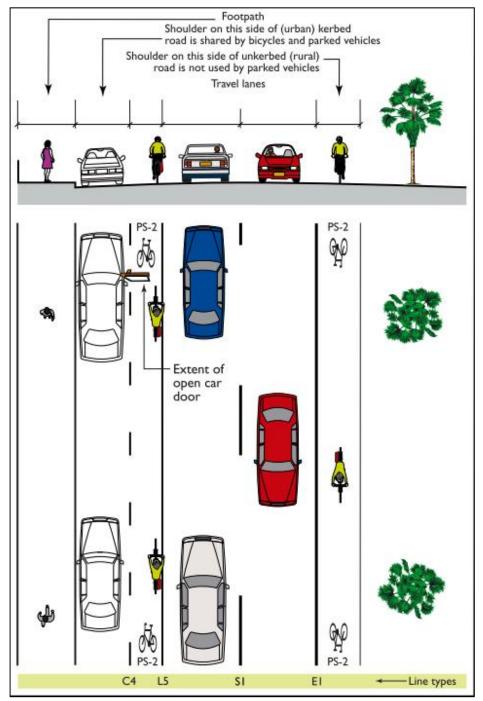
Typical Plan and Cross-Section for On-Road Mixed Traffic Bicycle Routes
